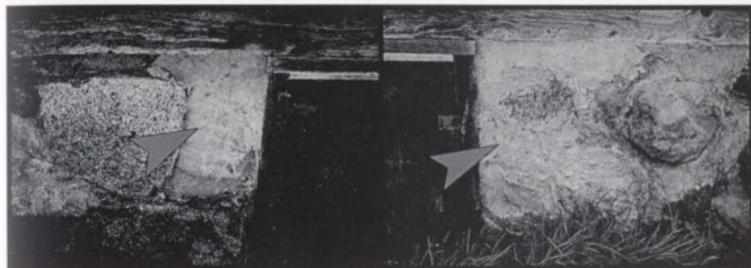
Minor cracks are apparent in the board-formed concrete foundation on the southern side of the eastern elevation.
